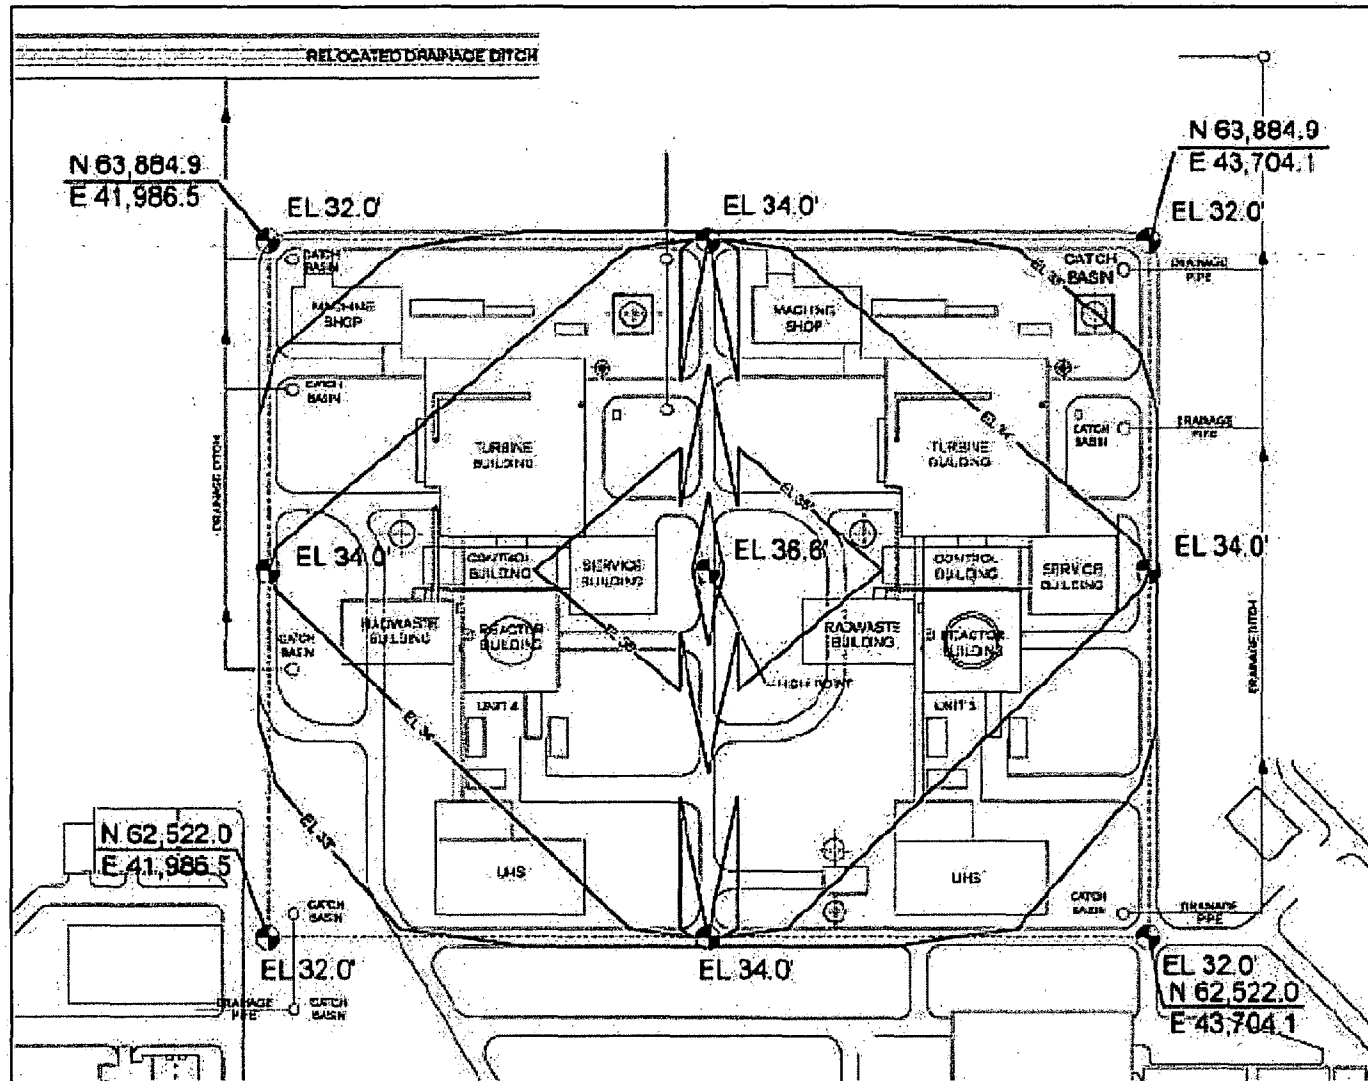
S.4-14: Units 3 and 4 Site Grading Plan
